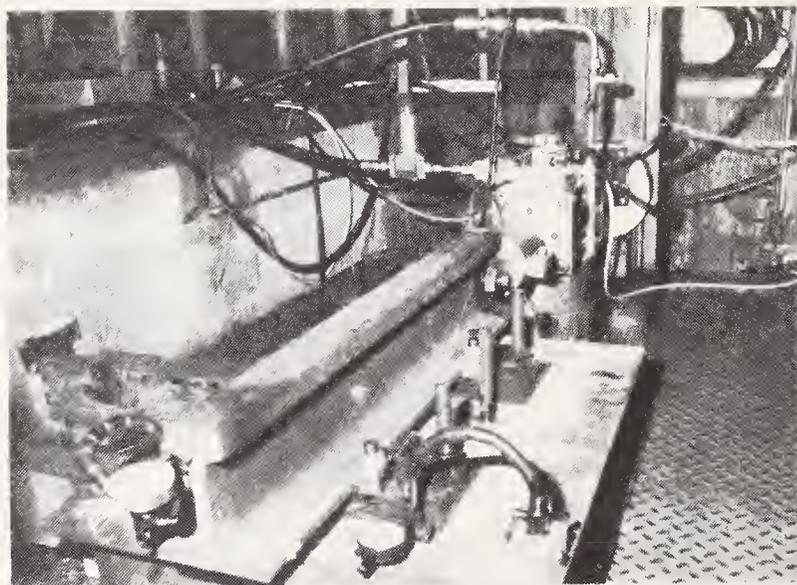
DFF LONGITUDINAL DEFLECTION TEST
